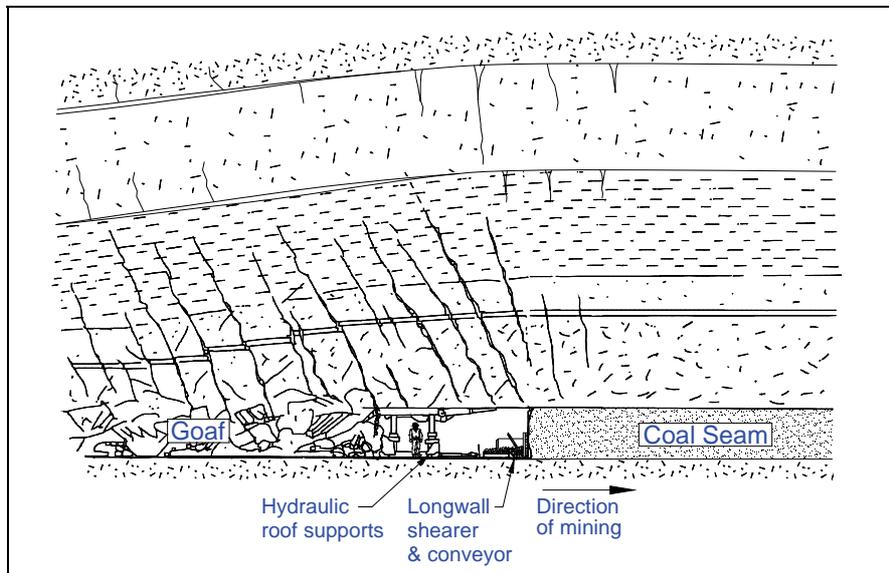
Cross-section along the Length of a Typical Longwall at the Coal Face
